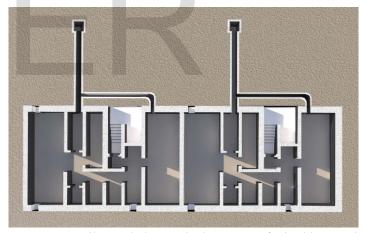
Anti-collapse shelter in the basement of a building with prefabricated panels
